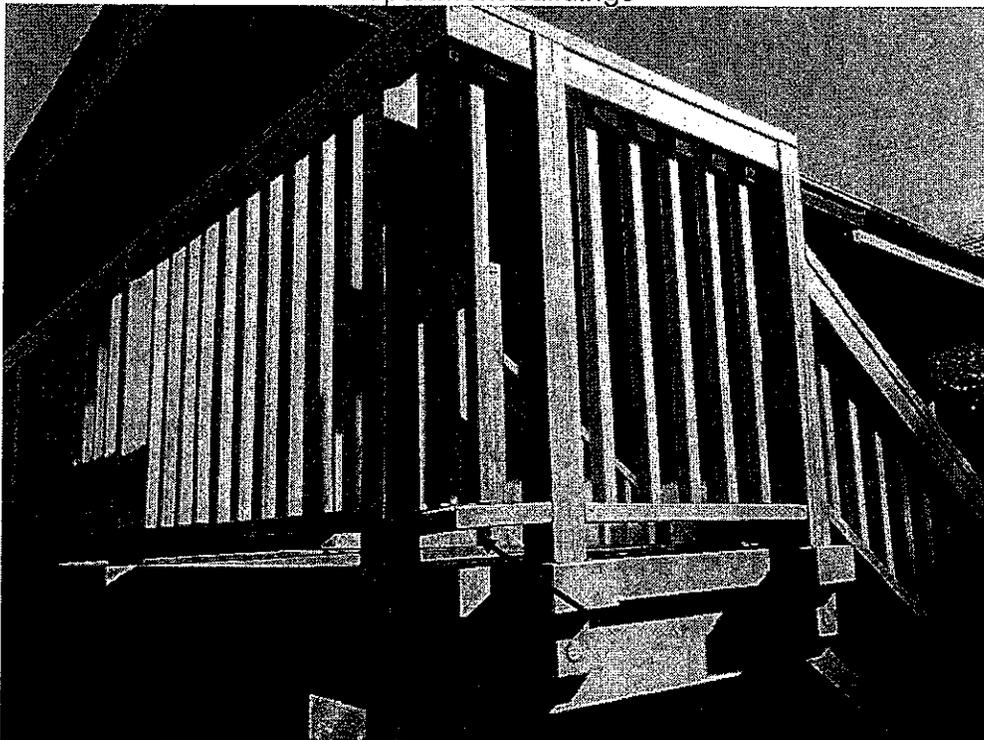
Some loose and damaged members of the second floor guardrail at the employee apartment buildings
